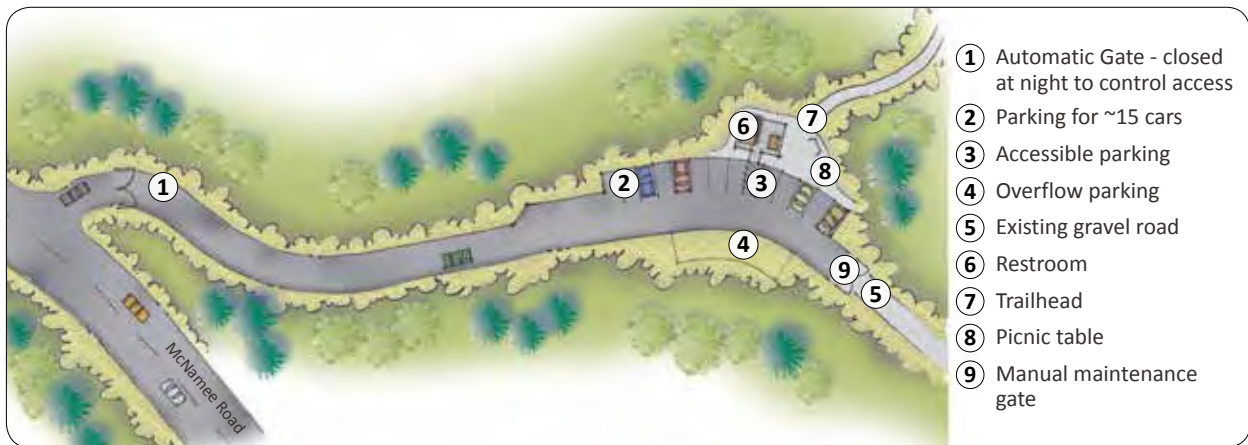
Proposed entry and parking lot at Burlington Creek Forest will accommodate ~15 cars.
